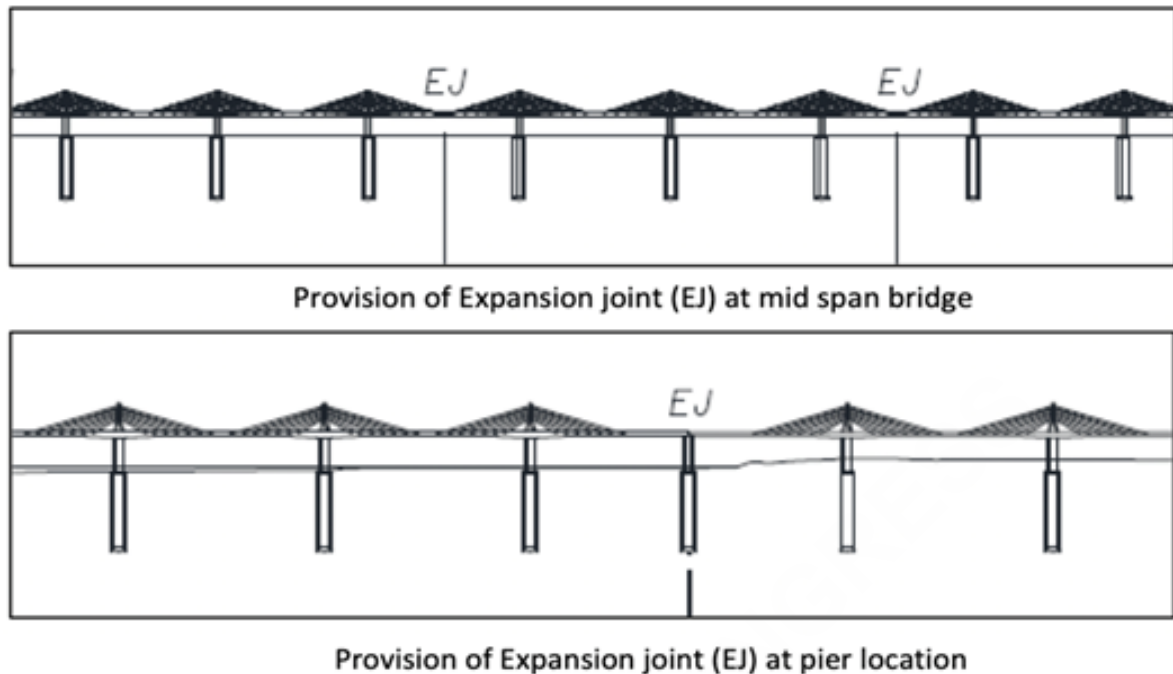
Location of Expansion Joints in multi-span extradosed bridge[6]
